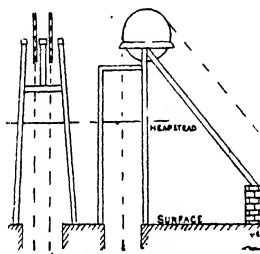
Front and Side Views of Pulley Frame and Pulleys
